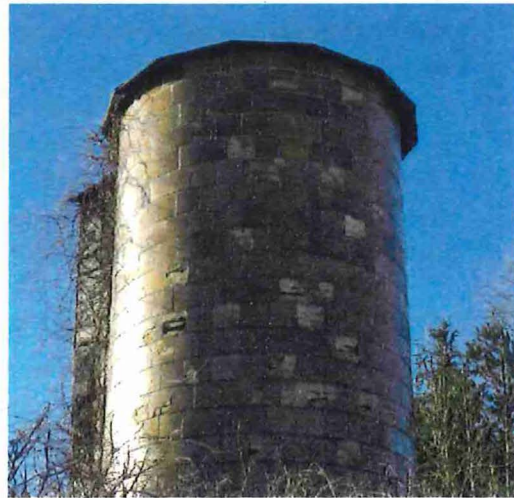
west elevation of silo showing fractured terracotta
